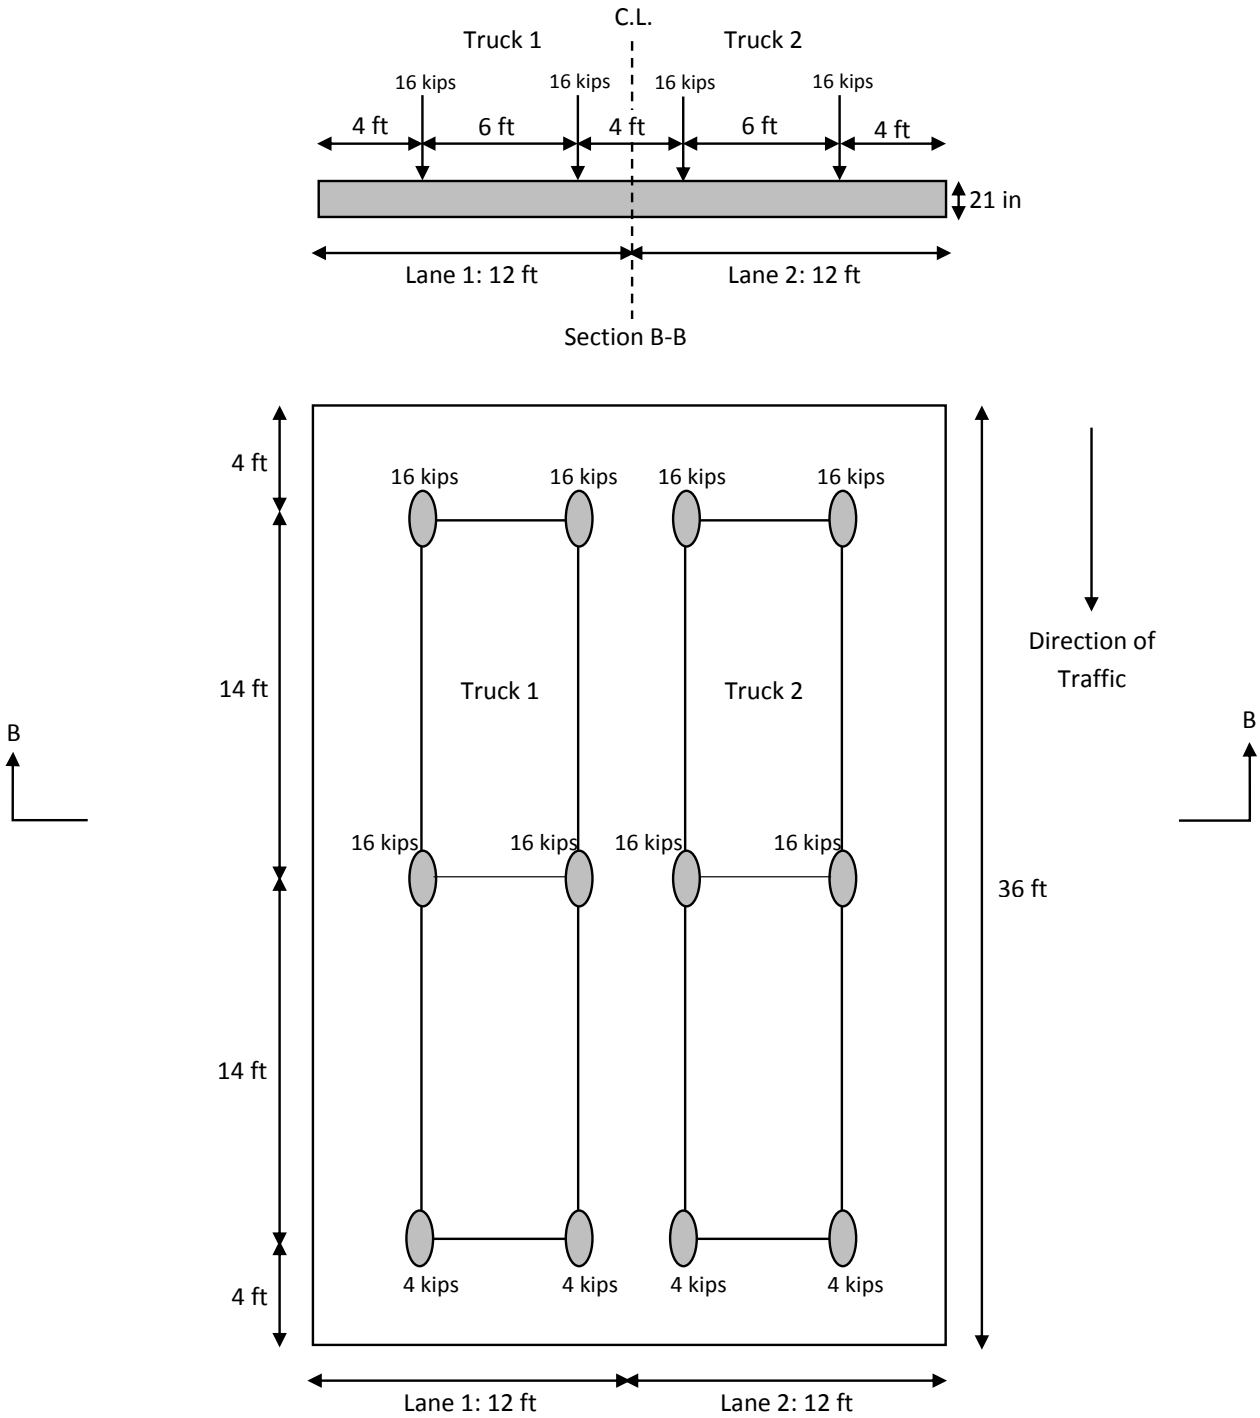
Typical Cross-Section and Plan of Two-Lane 36 ft Span Bridge under Center-Center Loading Condition.
